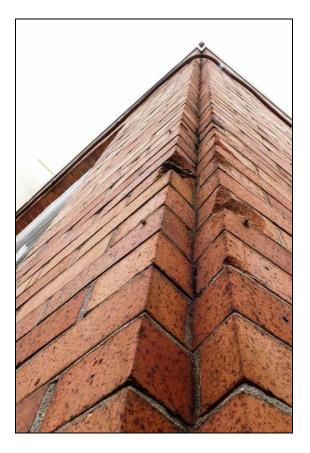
The site May 2016 – The corner brickwork of the main elevation – showing some decay and/or damage. Photograph: Blair Hastings.
